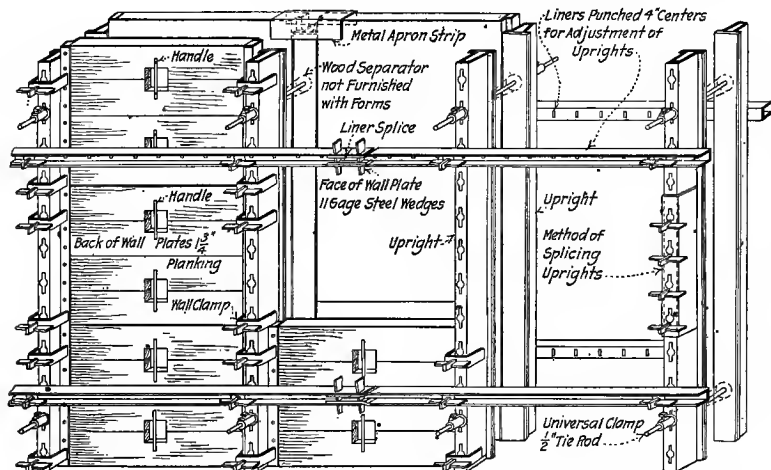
Hydraulic Pressed Steel Co. form assembly of liners and plates.
